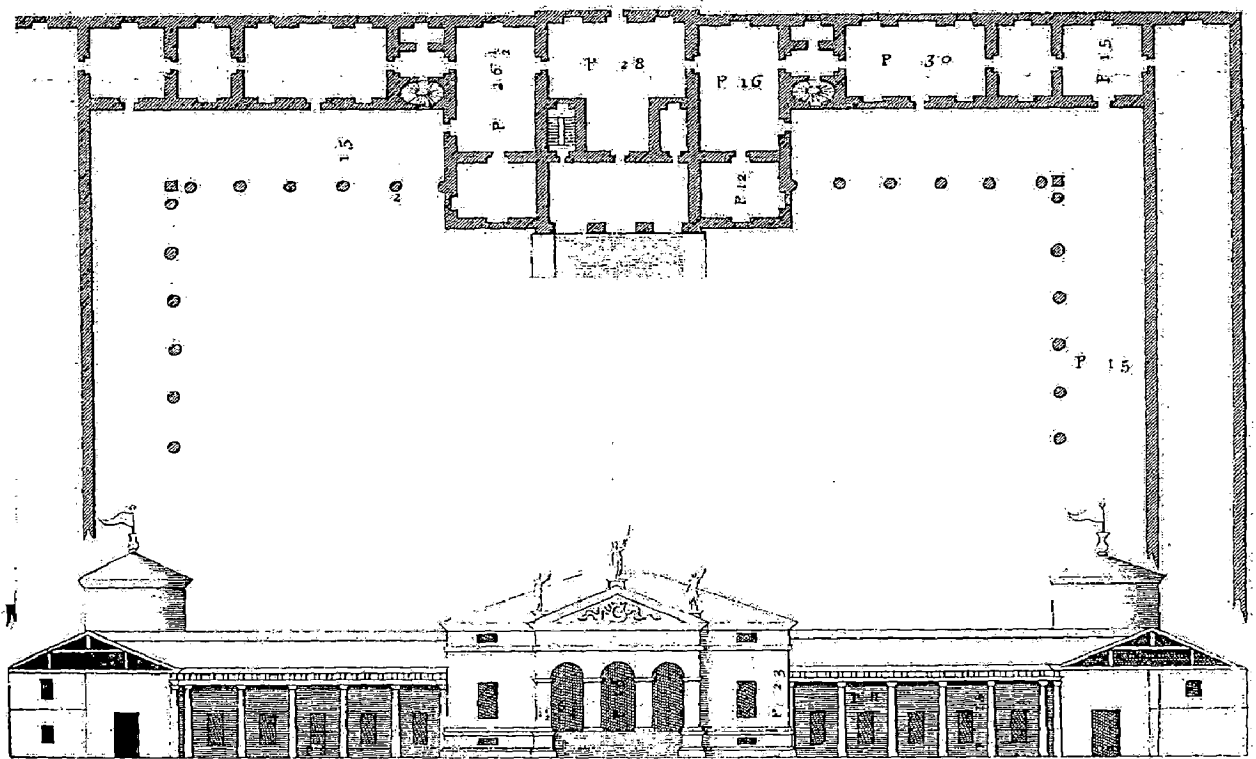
Villa Biagio Sarraceno at Finale in plan and elevation
